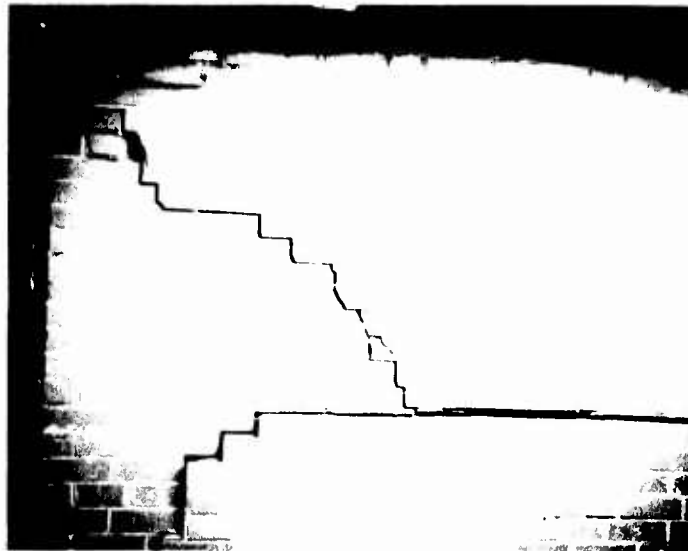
B. Close-up of Cracking Towards Corners for Test Wall No. 24
